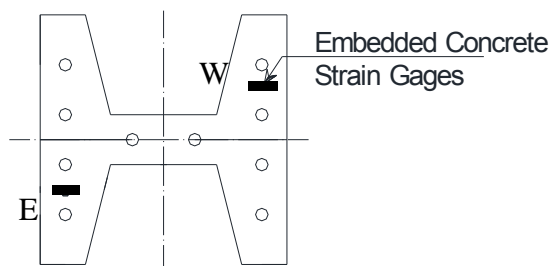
Embedded Concrete Strain Gage Location in Plan View
